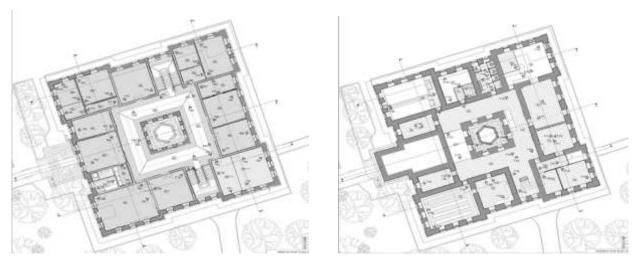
Secondary School Ground Floor Plan (Left), First Floor Plan (Right).
